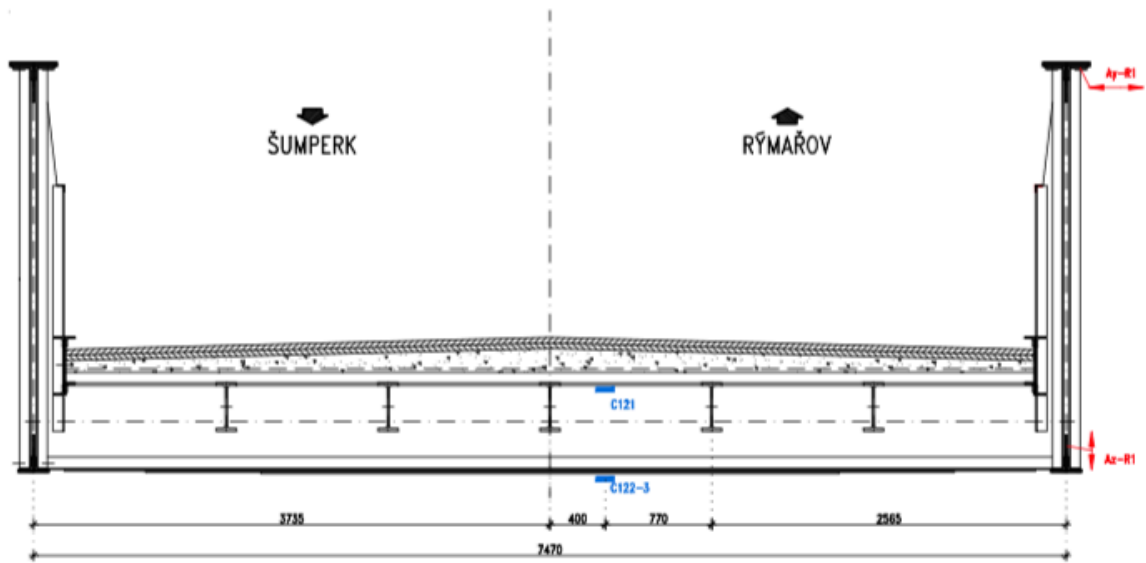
Monitoring Plan: Section 1-1 (Not to Scale).
